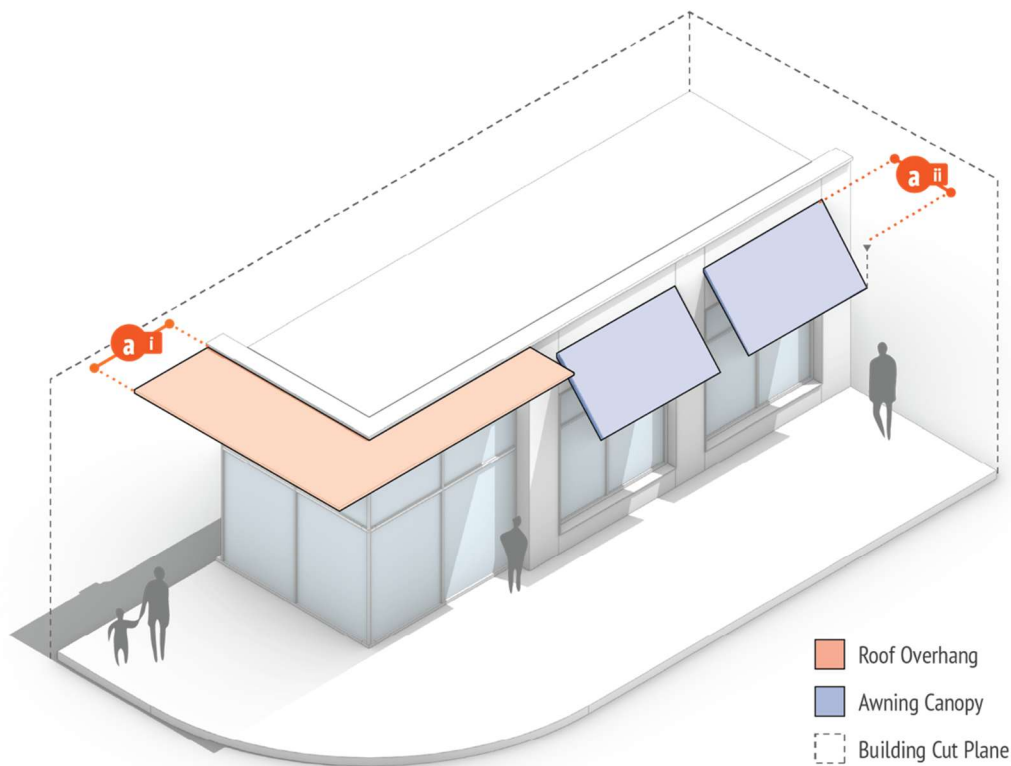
Building Entryway Design, Canopy/Roof Overhang
